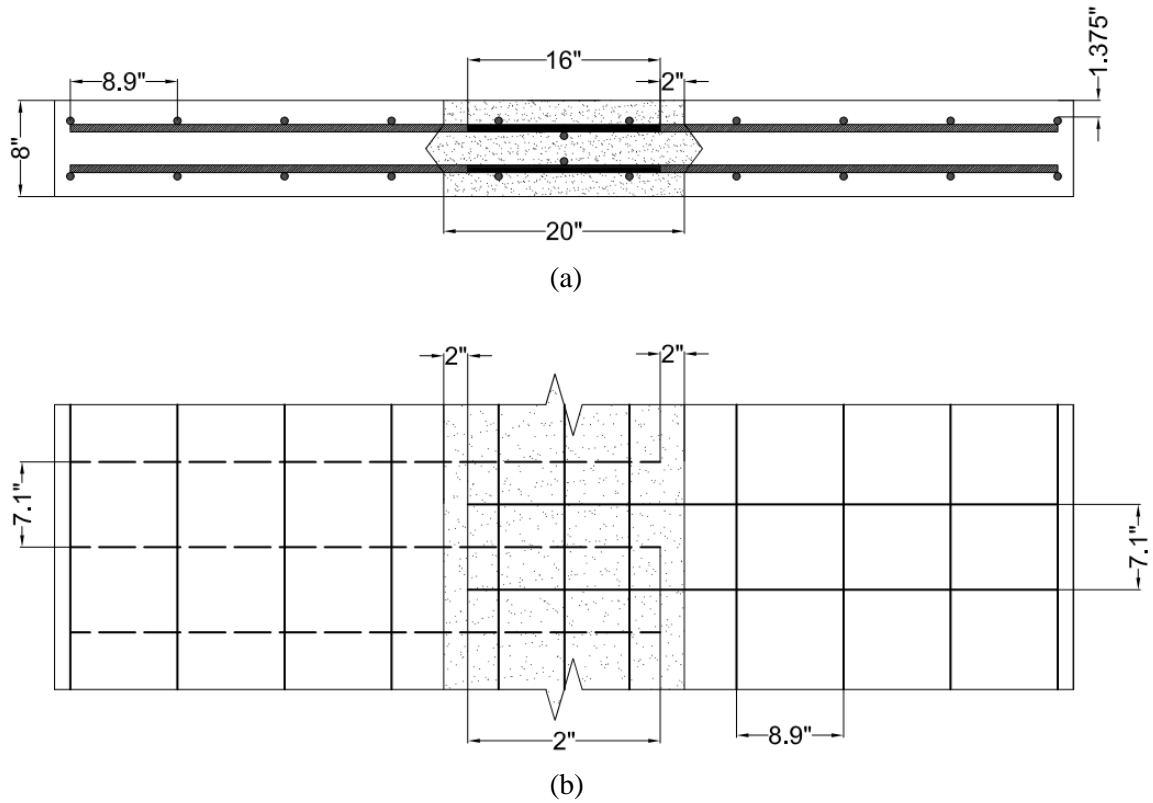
Development length of reinforcement for normal concrete ($f'_c=6.5$ ksi); (a) cross section view and (b) plan view
